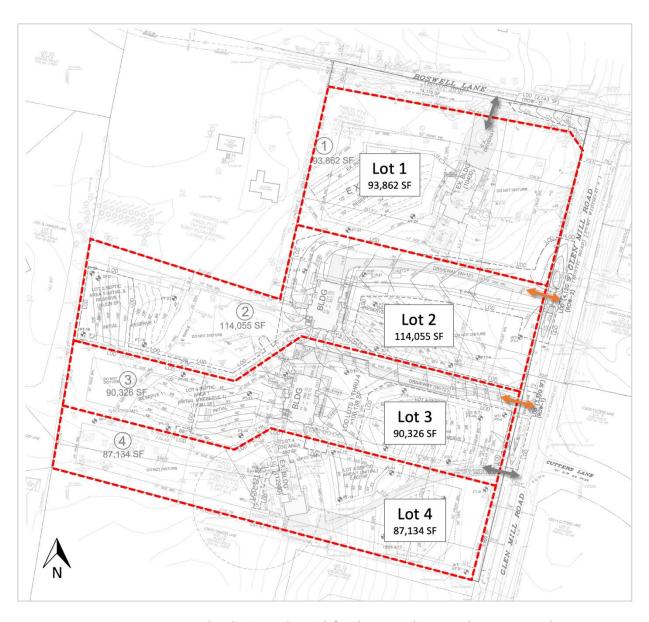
Proposed Preliminary Plan with four lots; new driveways (orange arrows) and existing driveways (gray arrows).
